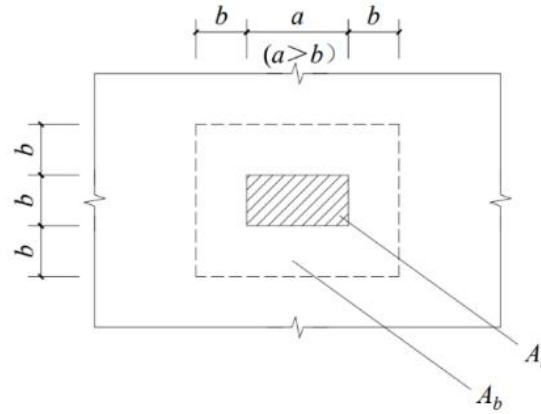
Simplified Diagram for Local Compression Calculation of Reinforced Concrete Floor Slabs
